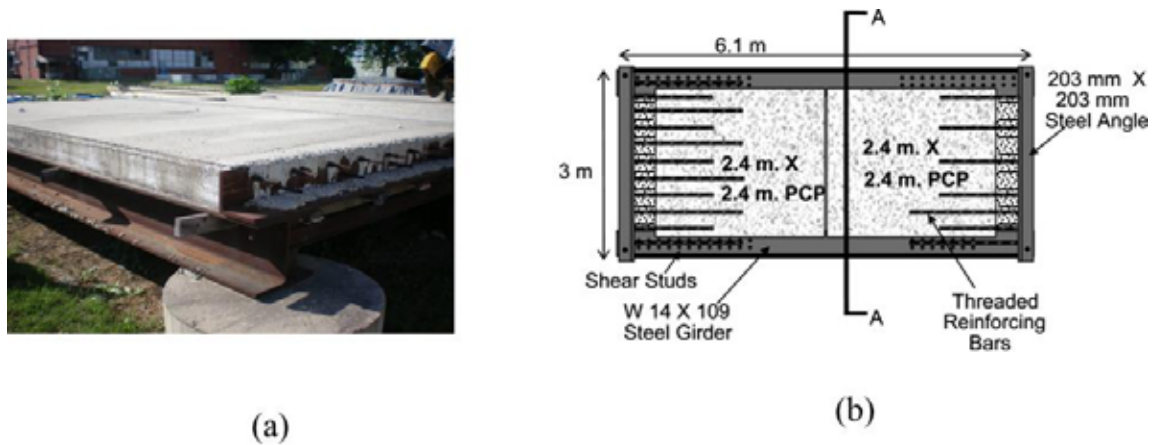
Large-scale bridge deck elements: A) Photo; B) Schematic
